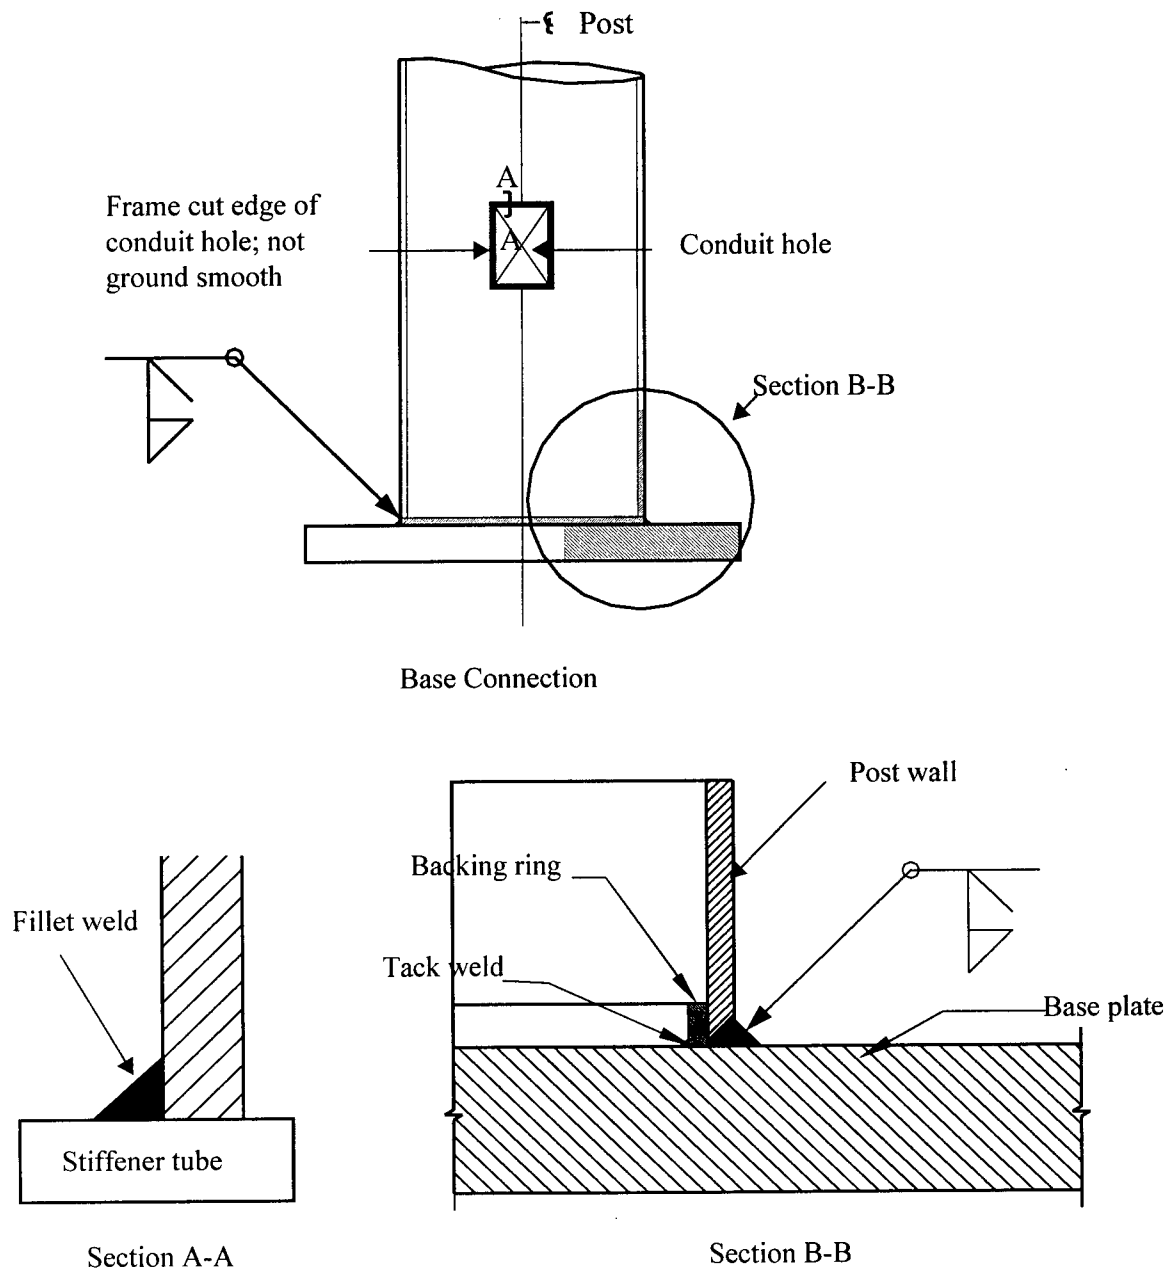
Connection details for Specimen AB1 (adopted from Gugino and Woody, 1996)
